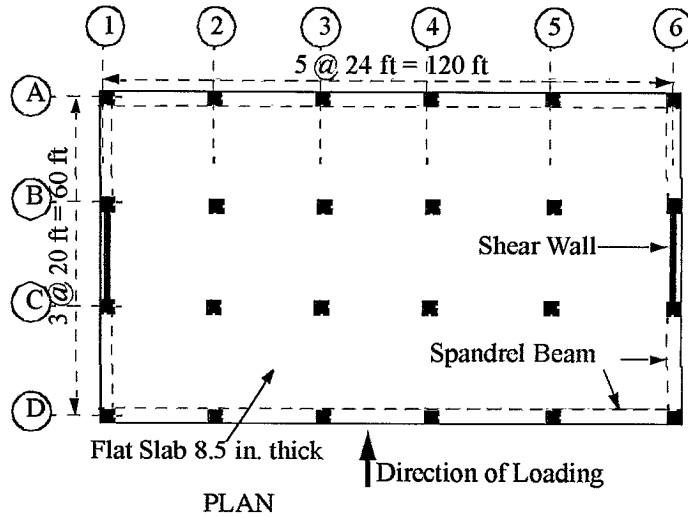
(b). Floor Plan of Residential Building Studied – Buildings #14, #15 and #16
